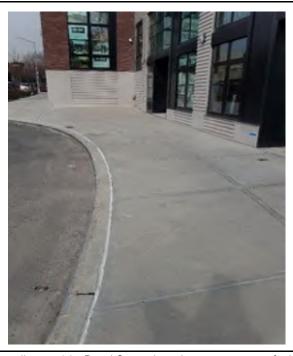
2nd street sidewalk near 365 Bond Street boat house entrance, facing northeast. 27 February 2019.
